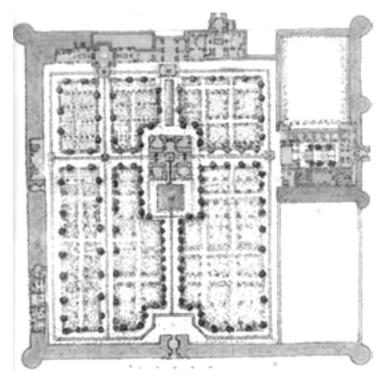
Plan of Fin Garden of Kashan (reference: Naima, 2006)
